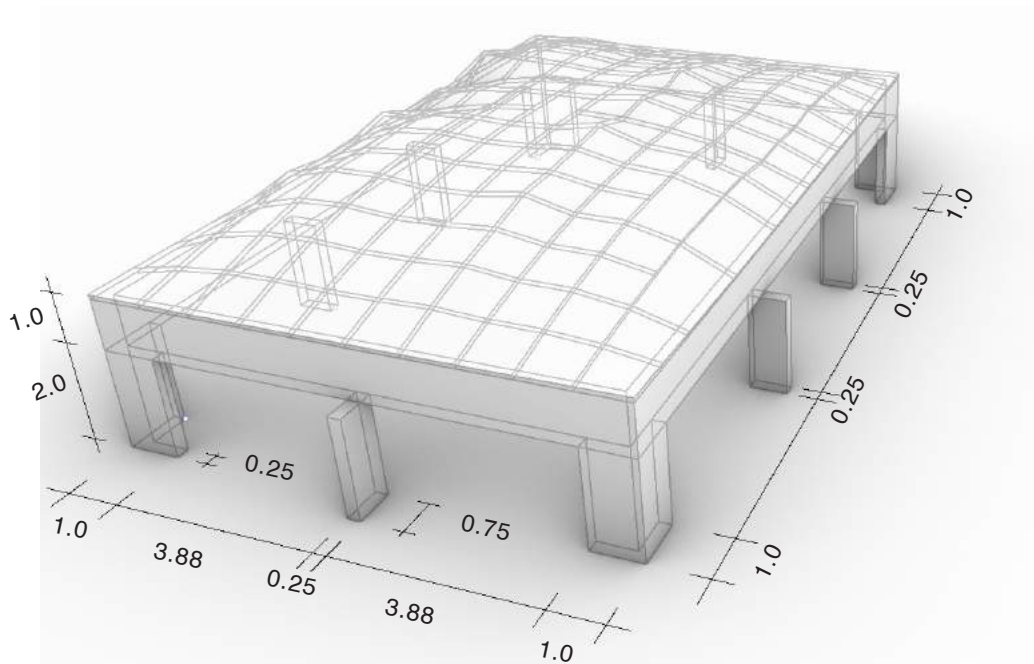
Final structure with shear walls and ring beams. (Own Work)
